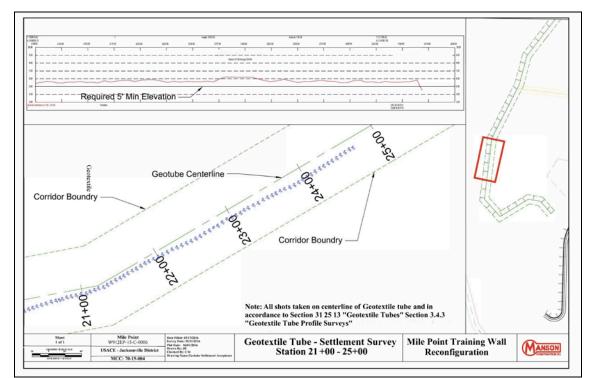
This figure, showing the elevations of the top surface of the geotextile tubes from Station 21+00 – 25+00, is a typical example of the elevations after installation and settling
